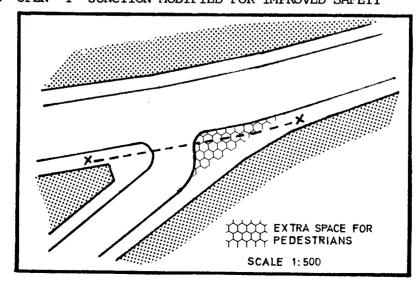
PLAN OF OPEN "Y" JUNCTION
